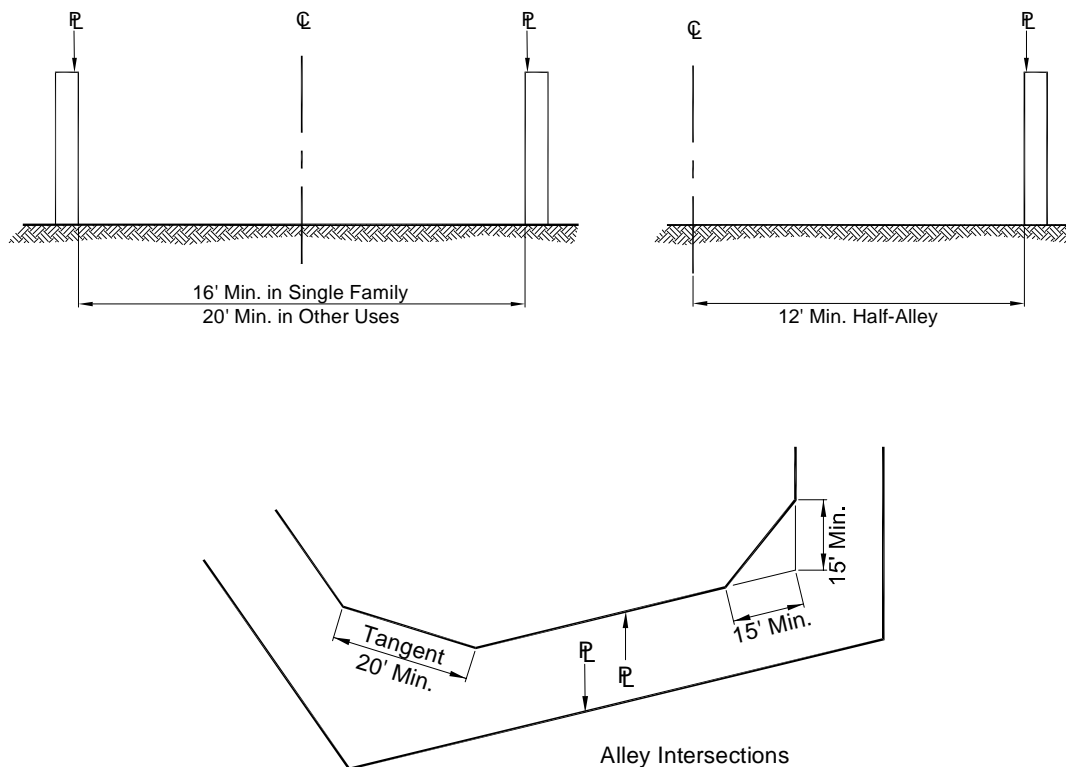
ALLEY WIDTHS AND INTERSECTIONS
